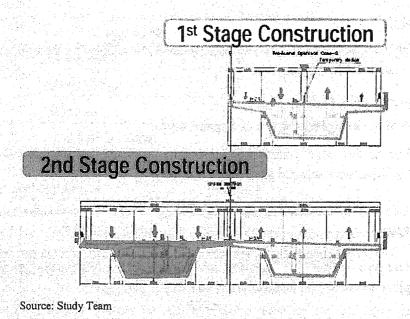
Typical Cross Section of Approach Bridges (Stage Construction)
